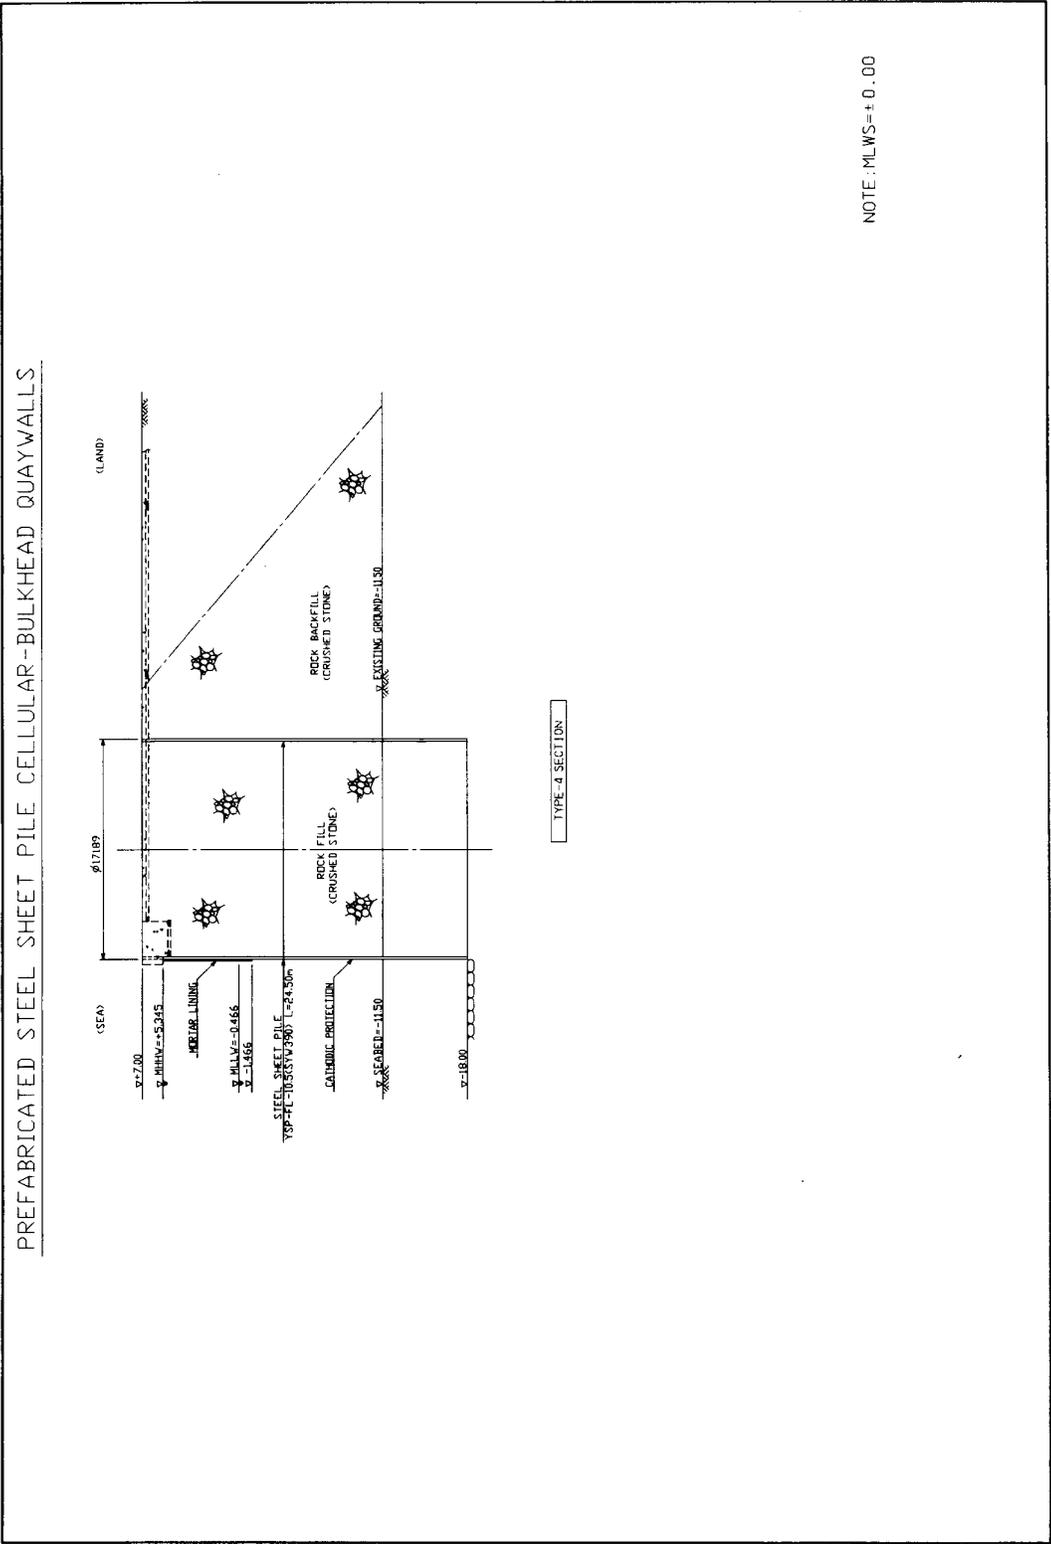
Section of Steel Sheet Pile Cellular-bulkhead Quaywall (TYPE-4)
